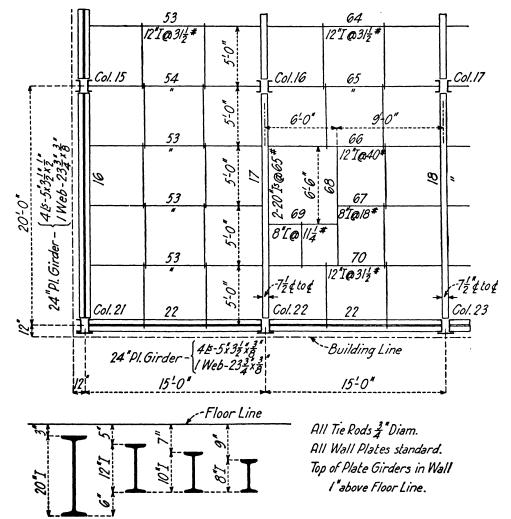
FLOOR PLAN OF STEEL OFFICE BUILDING.
